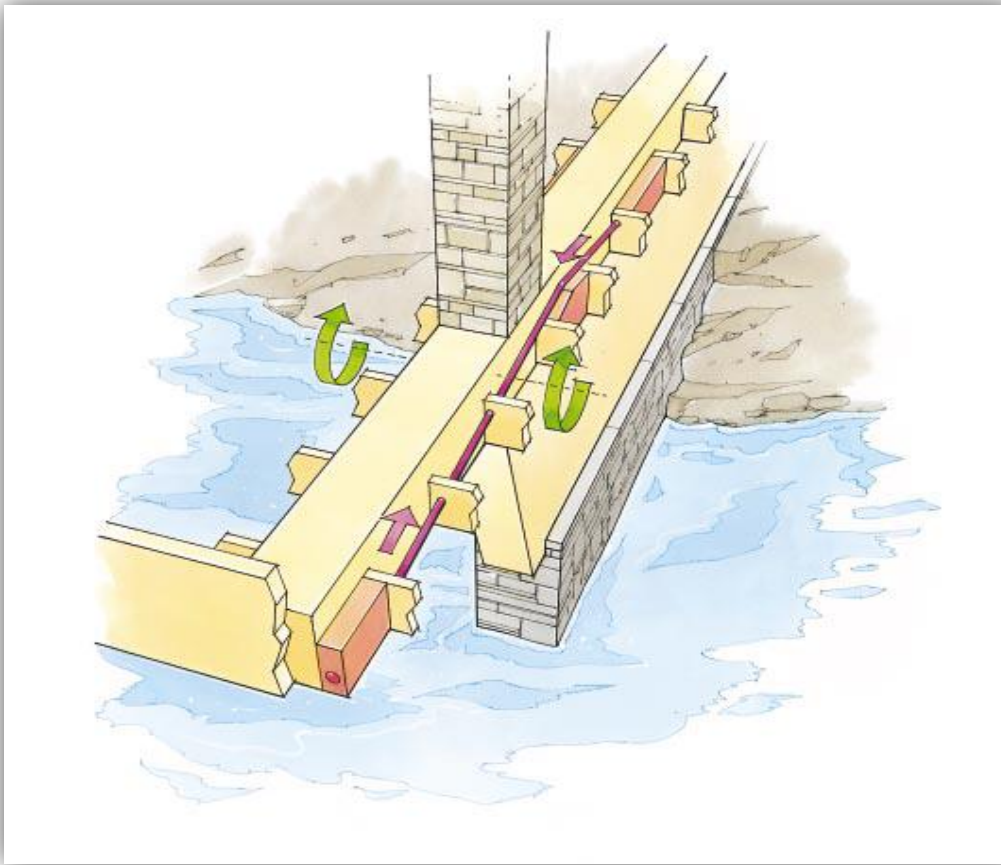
Strengthening method devised to strengthen the cantilever beam of Fallingwater (Source: Robert Silman & Associates)
